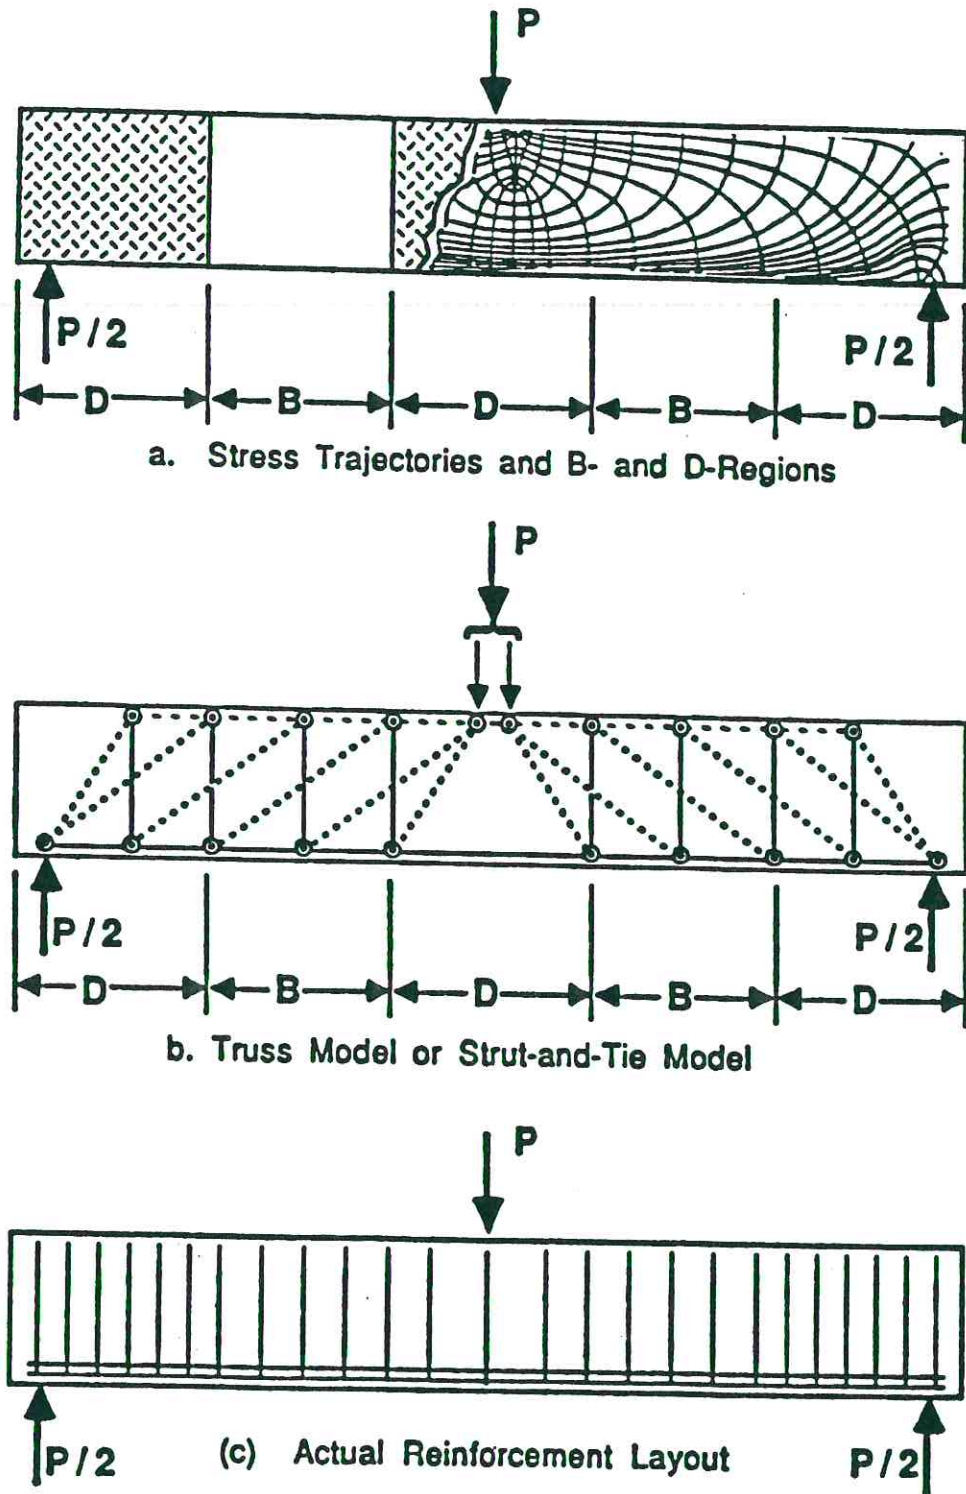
Truss action in a cracked reinforced concrete beam (from Ref. [7])
